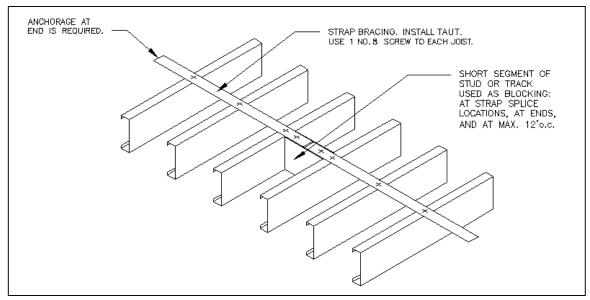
Ceiling Joist Top Flange Bracing with Continuous Steel Strap and Blocking
